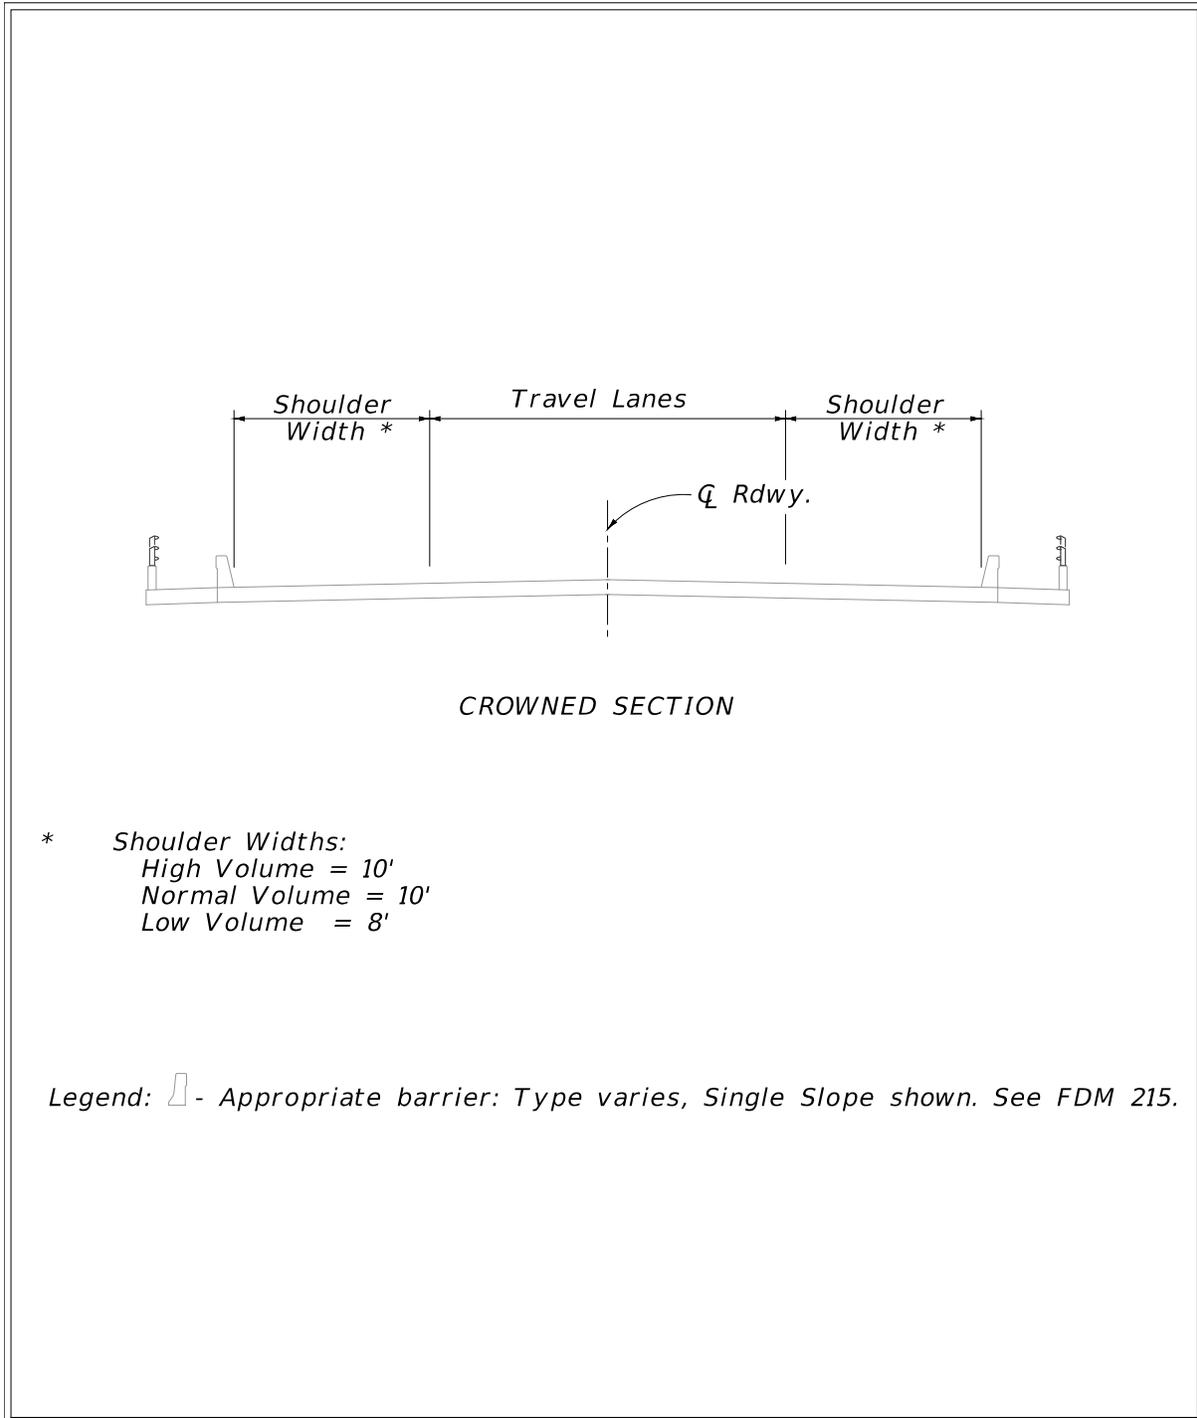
Bridge Section for Undivided Arterials and Collectors
